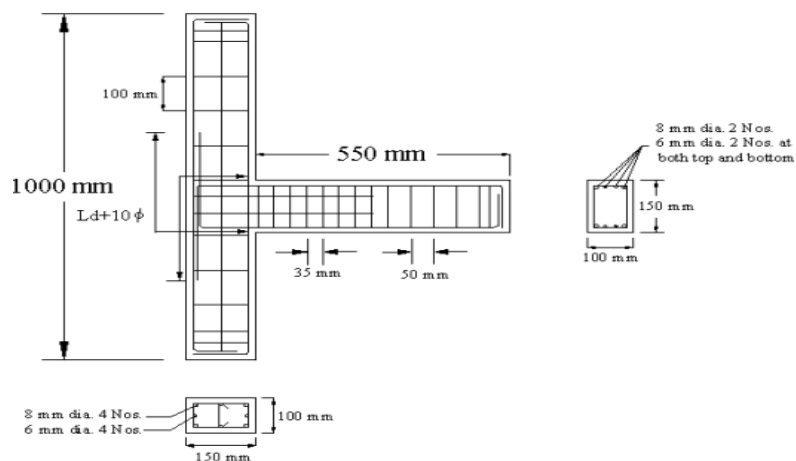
Reinforcement details of the exterior beam column joint as per IS 456 (BIS, 2000)
